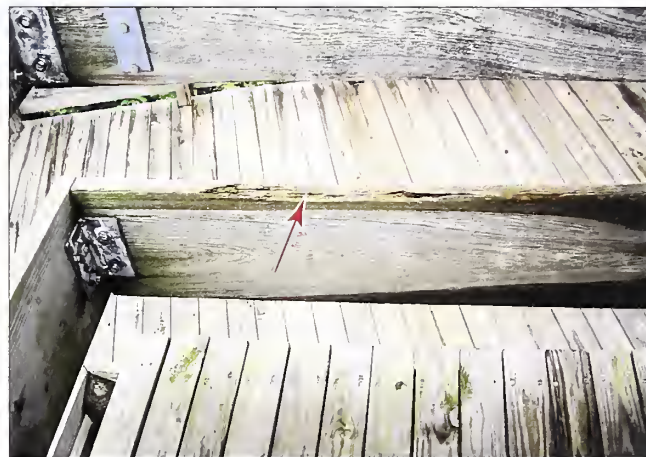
This guardrail board on an overlook tower is rotten. If it's the only rotten board, replacement is considered operations work that should be completed as soon as possible. If most of the boards are rotten, the entire guardrail should be recorded under item 05003 and replaced.
